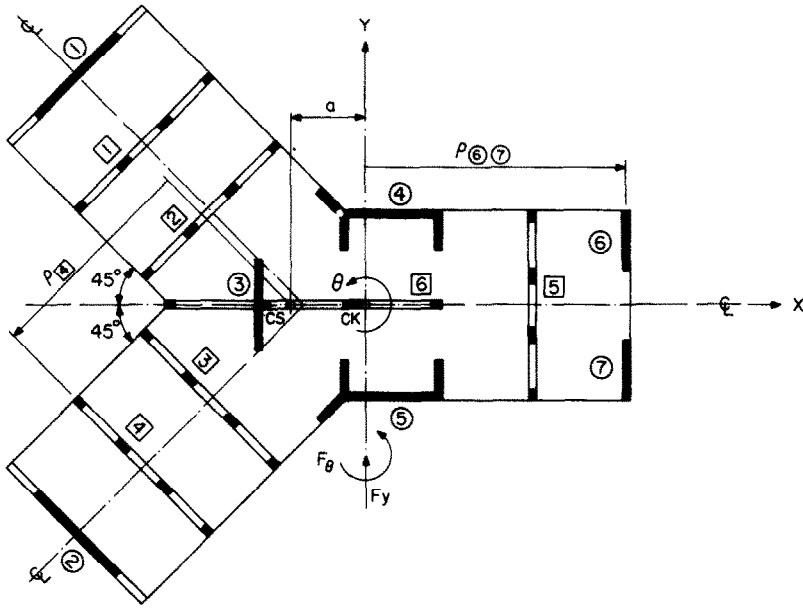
Typical floor plan, asymmetric wall-frame structure (free adaptation from Ref. [6]).
